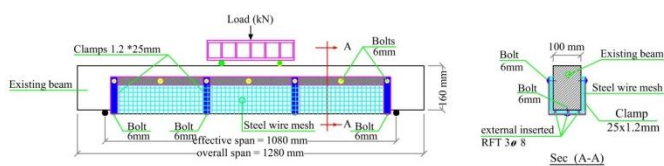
b] External additional horizontal steel bars 3Ø8 with 4 vertical steel clamps distributed uniformly.
